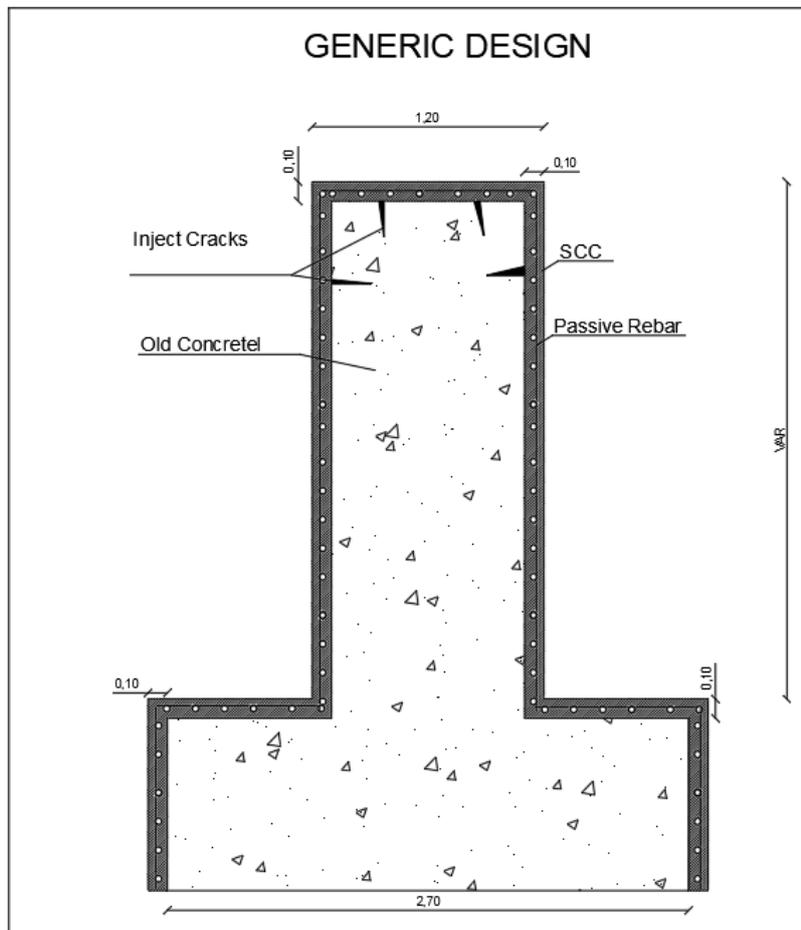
Generic detail proposed for the recovery solution and structural reinforcement of the foundation elements of support towers
